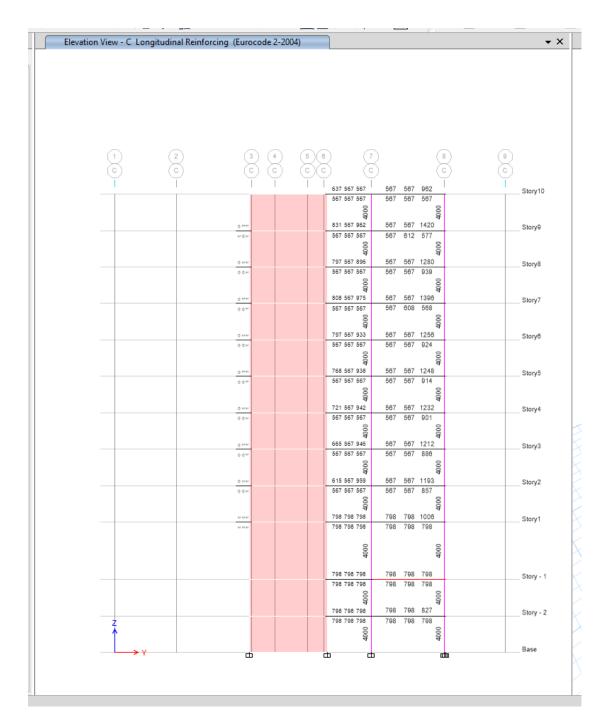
Concrete frame design ETABS output (Longitudinal reinforcement, Elevation view C-AXIS)
